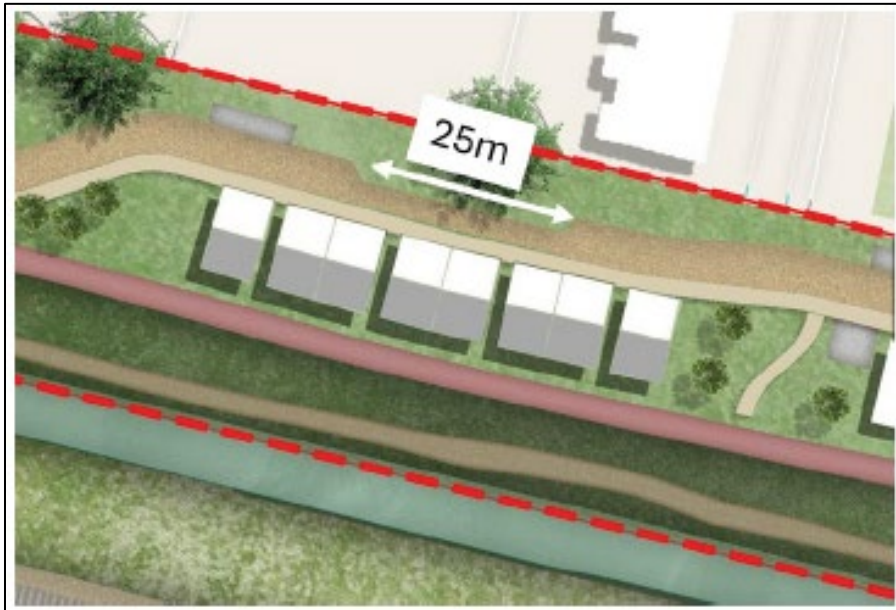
Proposed Section with Yield System (Extract from Figure 6-2 of the Draft Old School House Masterplan, FCC 2025)
